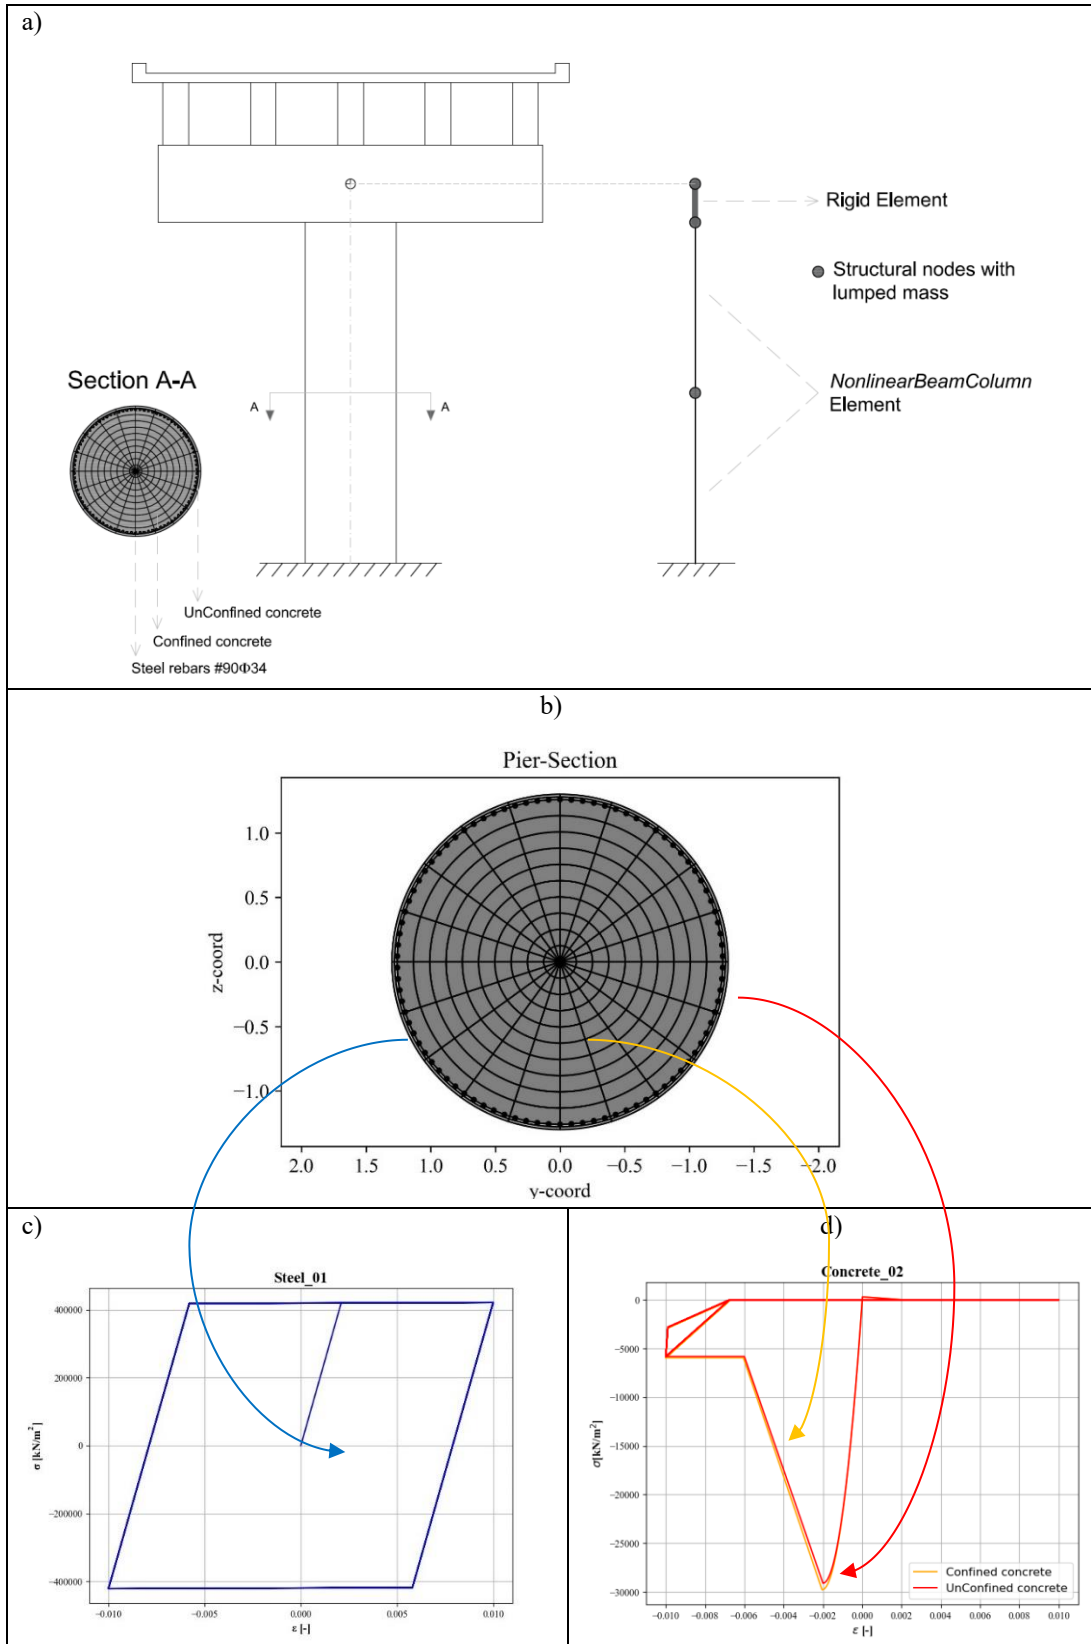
Bridge column model: a) Modelling details; b) pier section fiber discretization; c) Material hysteretic stress-strain law for reinforcing steel fibers; d) Material hysteretic stress-strain laws for unconfined (red) and confined (orange) concrete fibers.
